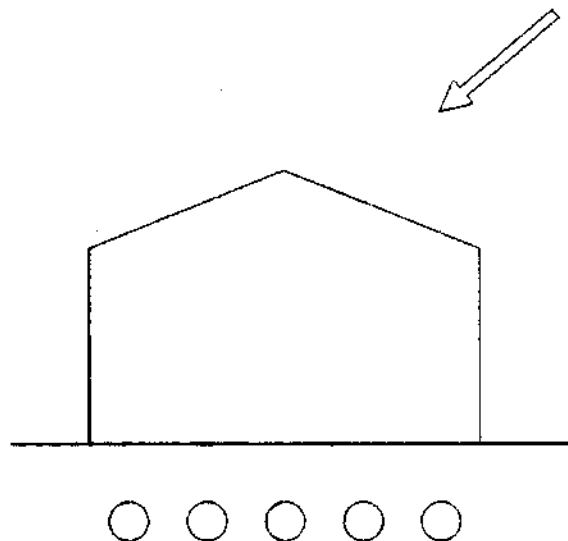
Cross-sectional view of the greenhouse earth air tunnel.
